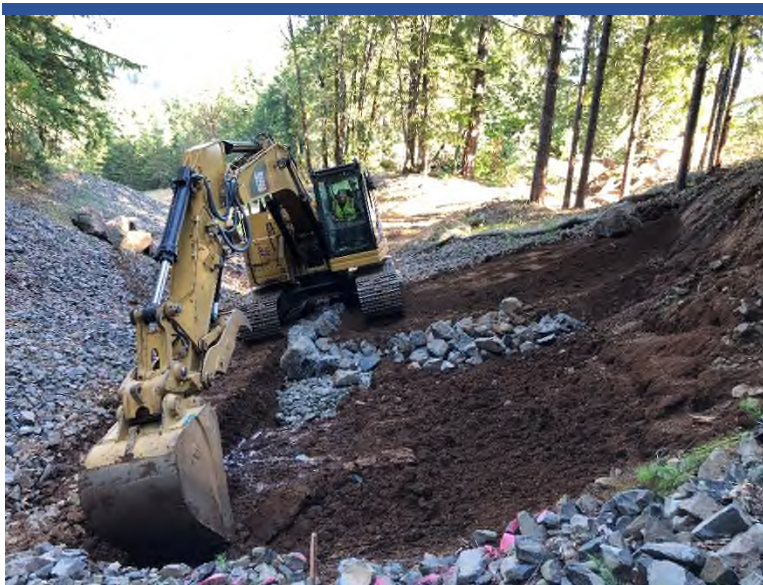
ERRS excavating upgradient end of key anchor trench at toe of Furnace Creek Old Furnace slide repair area.
